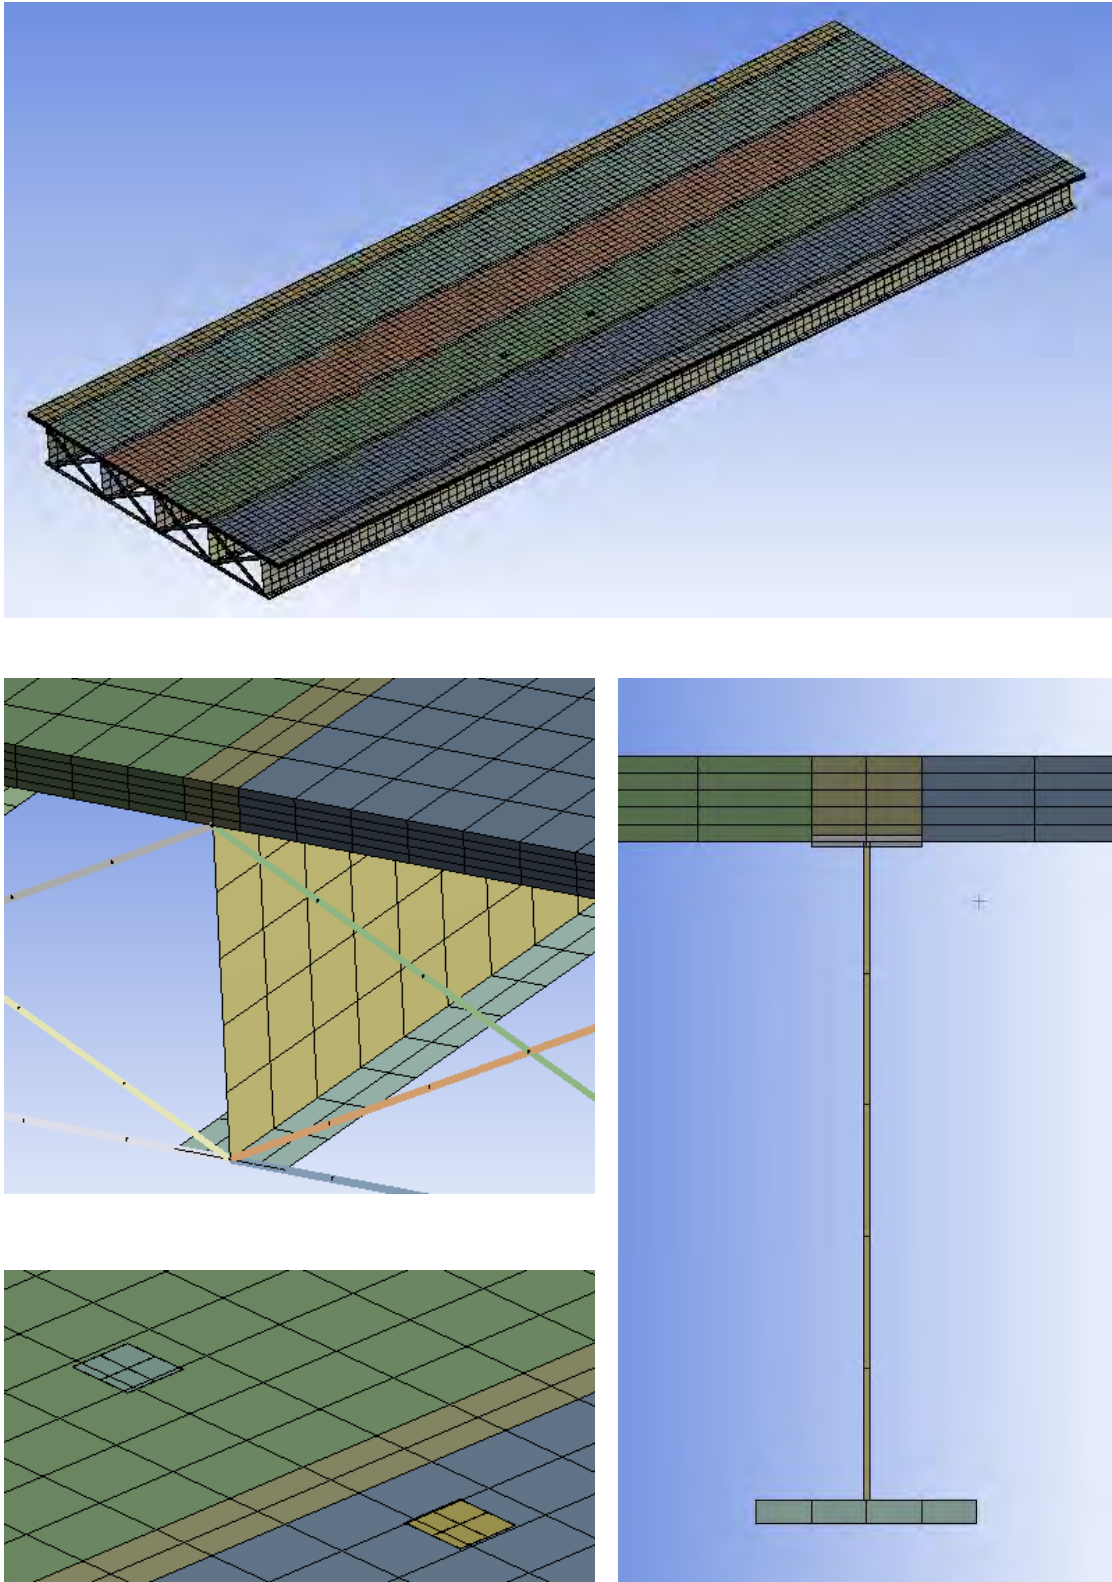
FE model for a 40 m simply-supported bridge with 5 parallel girders
